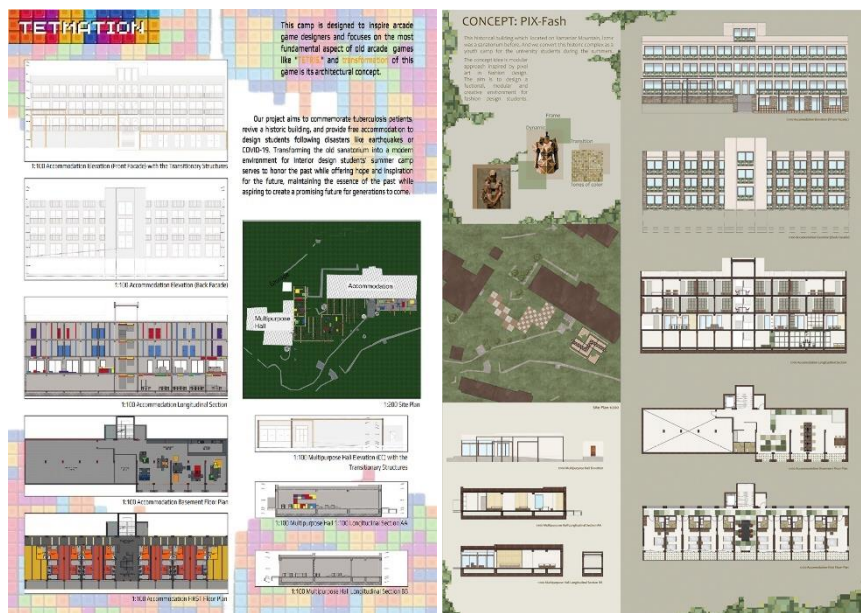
1:200 site plan and 1:100 plans and facades of the Tet+mation (left) and Pix-fash (right) projects (IAED, 2023)
